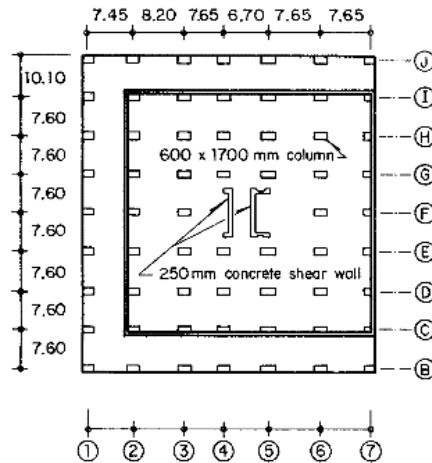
Mexico 1985: 15+-story Office Building [64]
